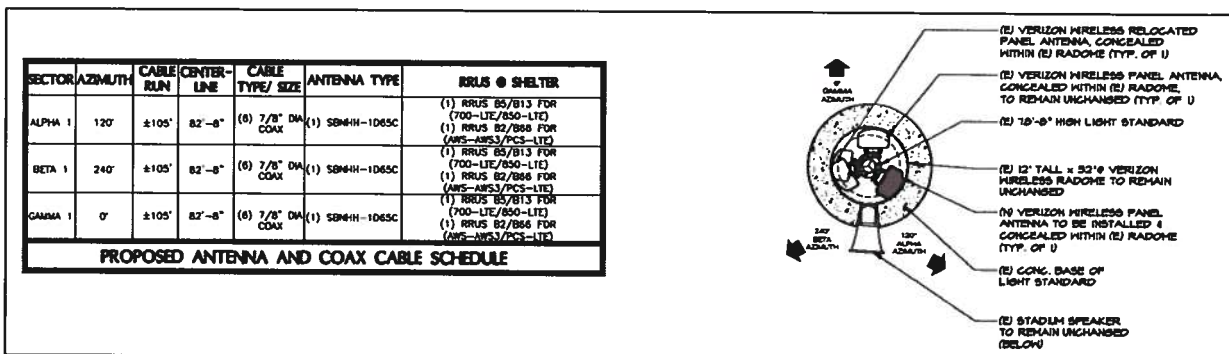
Proposed Antenna Plan View (Source: Plans dated 01/23/19).
